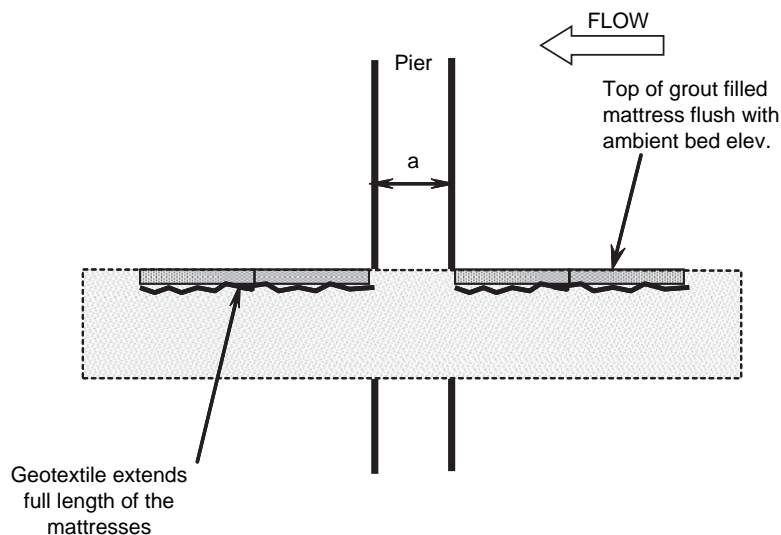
Typical grout-filled mattress coverage test layout.
